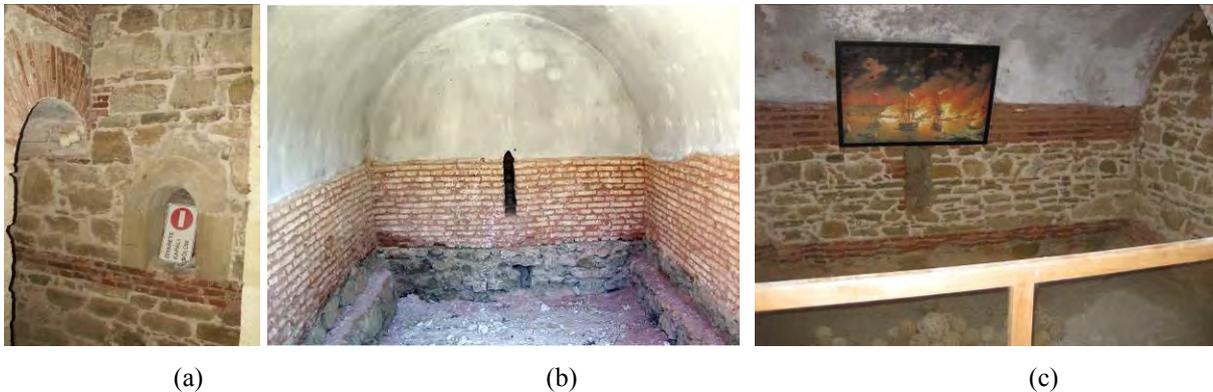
Powder magazines of Namazgah Bastion, (a) brick arche and niche 2013, (b) vault and brick walls which were placed on rubble stone foundation walls, 2007, (c) brick and rubble stone alternating wall and ventilation holes, 2013.
